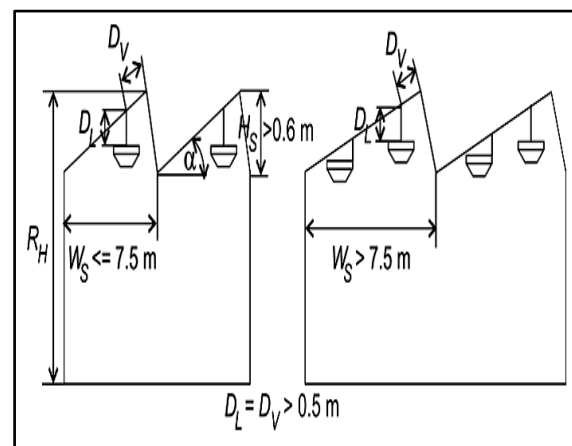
Fire Detectors Arrangement In Case With Roofs With Several Slopes (Figure Source: Fire Protection Systems Designing, Milan Blagojević, Unpublished)
